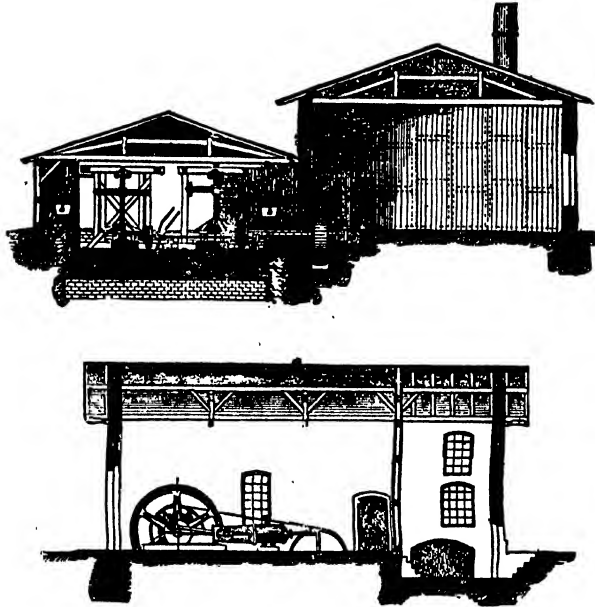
and 116.—Installation at Mines in Spain: Power and Angle Station—Plan and Sectional Elevation.
